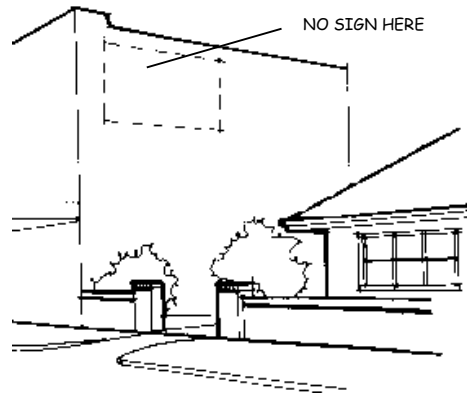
Signs should not be located on walls facing onto adjoining residential premises.
